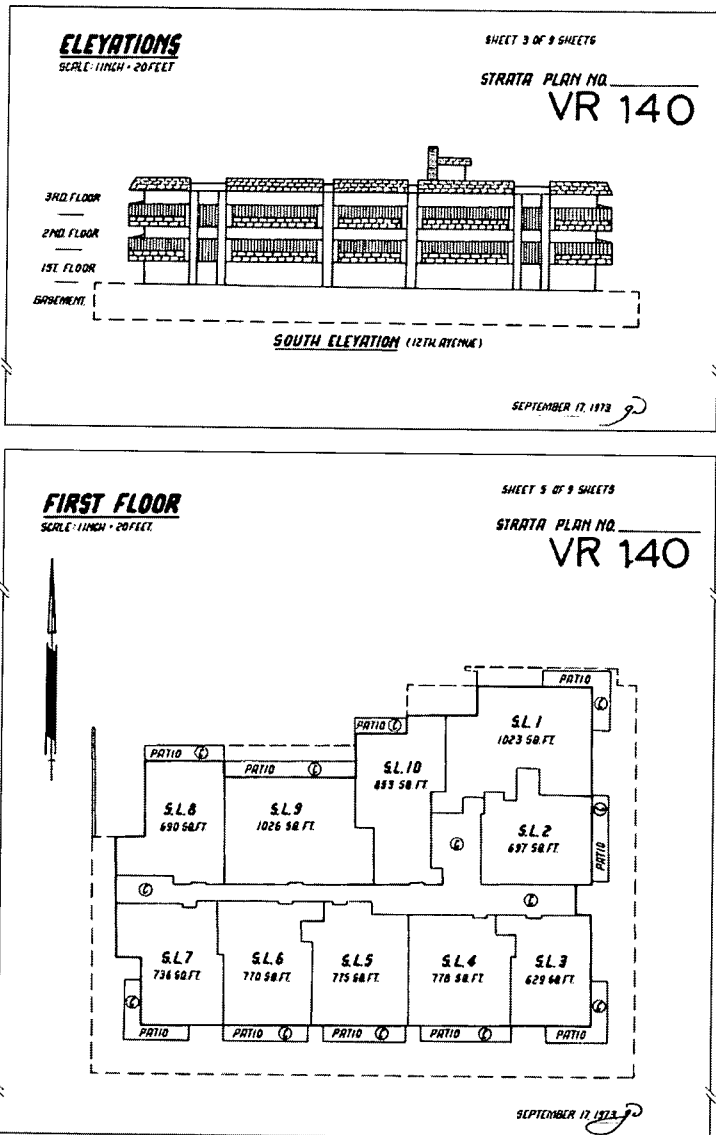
Portions of two sheets from Strata Plan VR140 showing the South Elevation of the three-storey building and the First Floor layout, including ten strata lots and common property.
